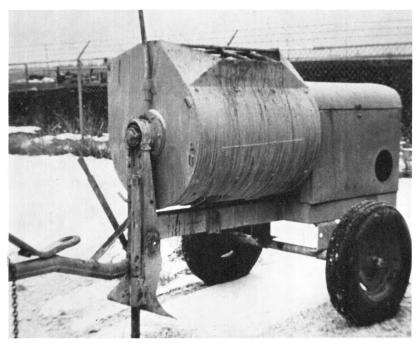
Highway maintenance crews used this typical mortar or plaster mixer for mixing concrete and/or mixing asphalt emulsion and/or slurry mixtures. This was one of the mixers we utilized later on in other crack filling activities. The only modification necessary was the addition of a tapered, threaded tap made in the bottom of the drum so that an elbow, valve, and reservoir could be placed underneath this outlet to control the discharge of the slurry which then was picked up by the pneumatic pump and pumped into the pavement cracks. The pumpable slurry crack sealing mix was designed in our bituminous laboratory and the best formulation for this pumping operation involved a 50% limestone aggregate and a 50% CSS-1 emulsion by weight.
